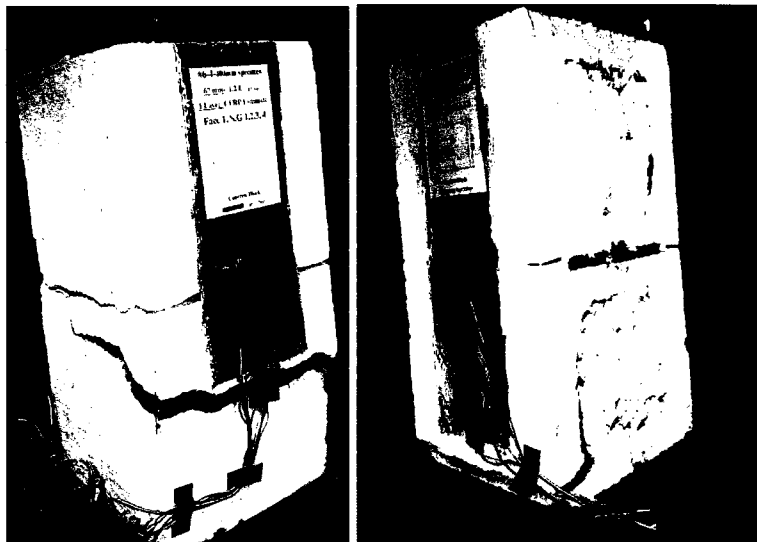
Typical failure of concrete block Specimens #6-3 and #6-6
